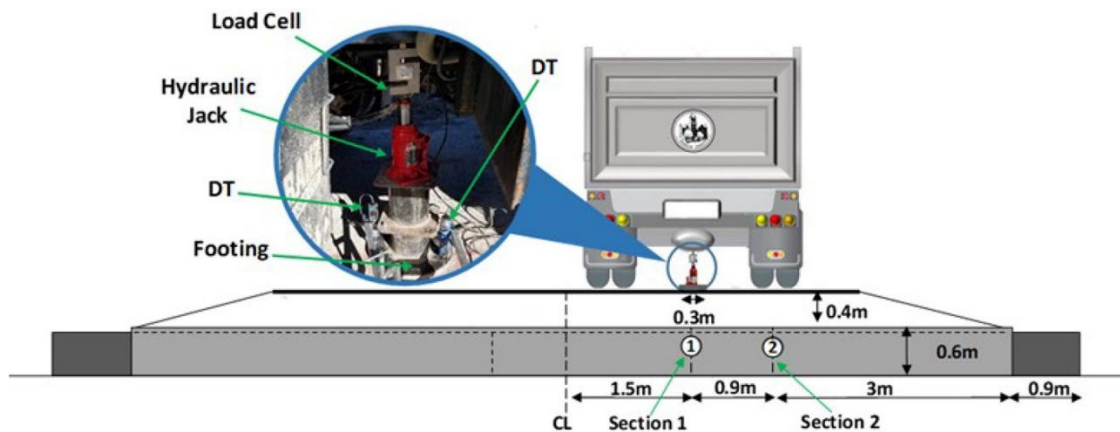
Plate loading test setup (not to scale) (Rahmaninezhad et al. 2020).
